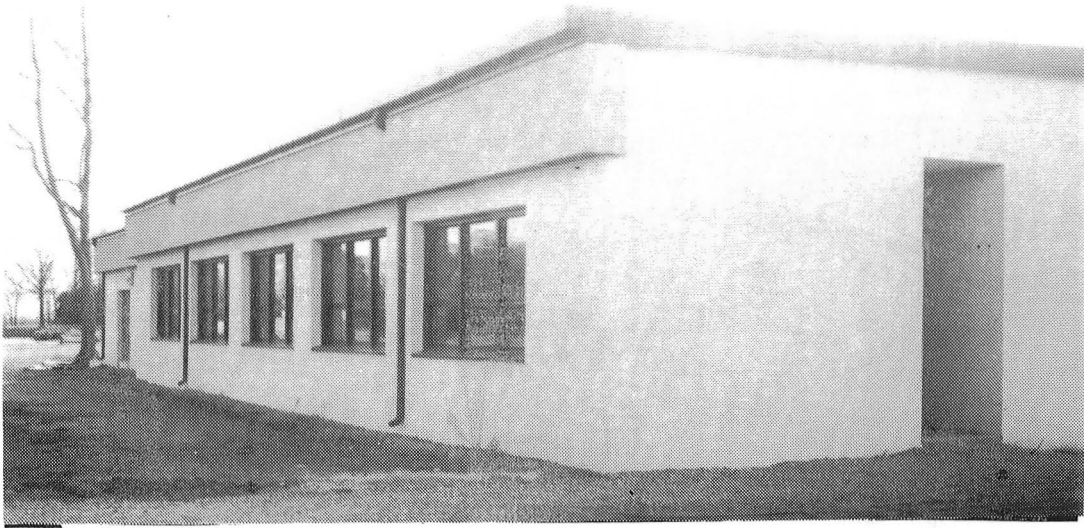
PHOTO OF REAR SHOWING WINDOWS
